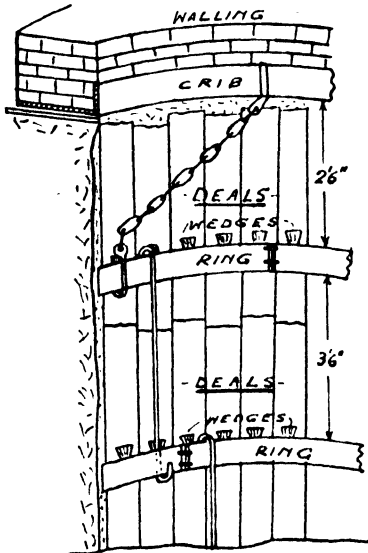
Elevation of Temporary Lining for a Sinking Pit.
